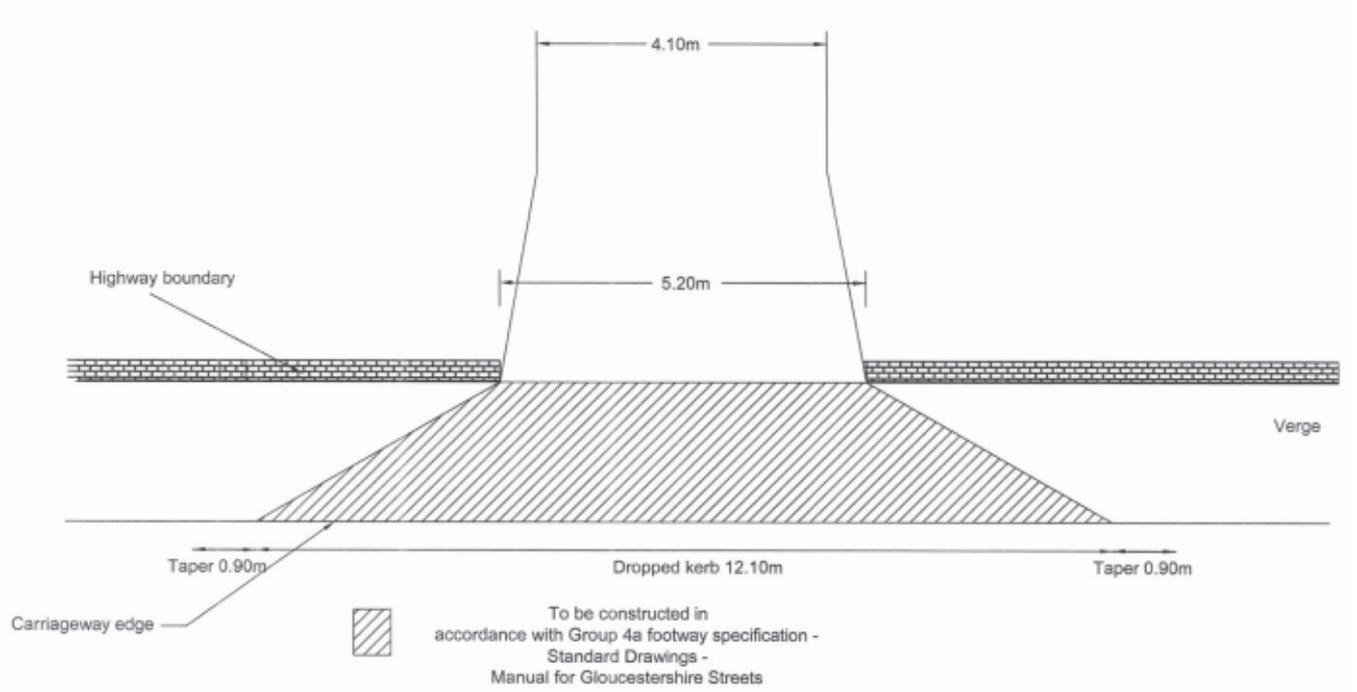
Standard access to 2 to 5 dwellings over verge (only to be used on Class 4 highway or below).
